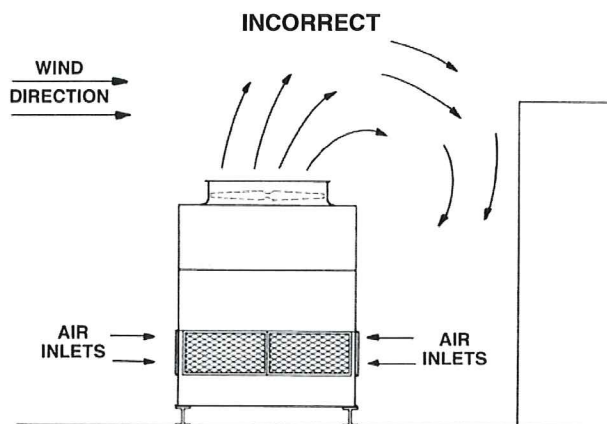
Installation with Top of Unit Lower than Top of Wall
